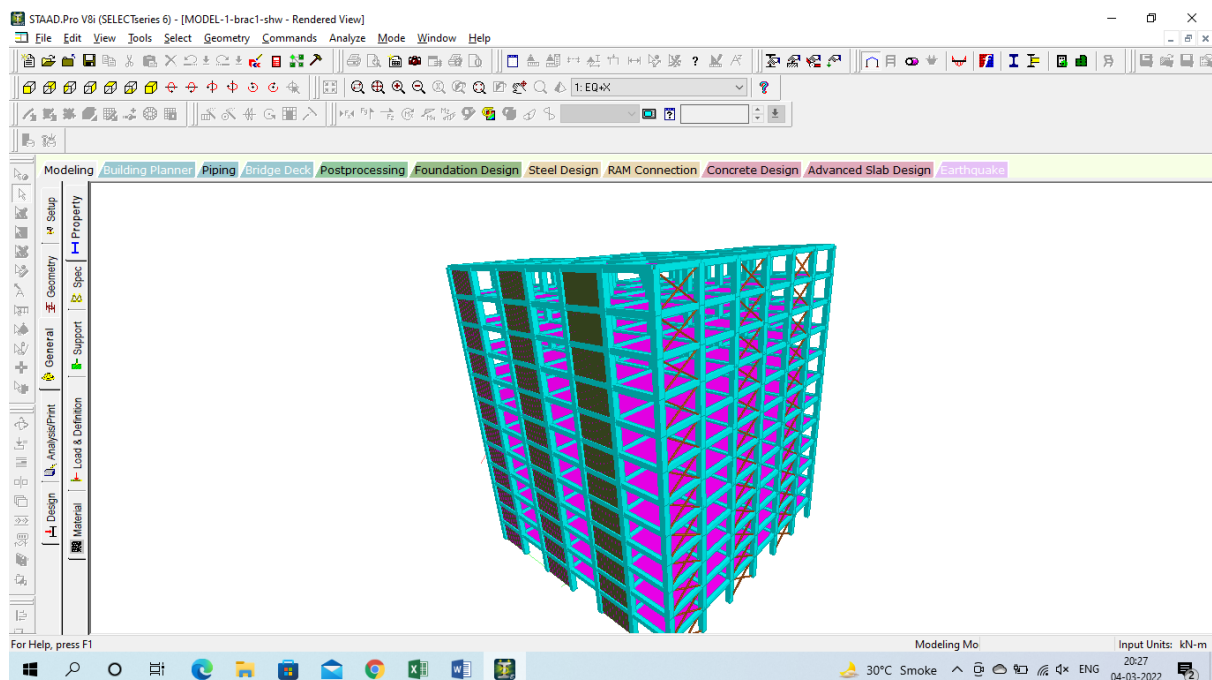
Location of bracings and Shear Wall assigned to model-IV
